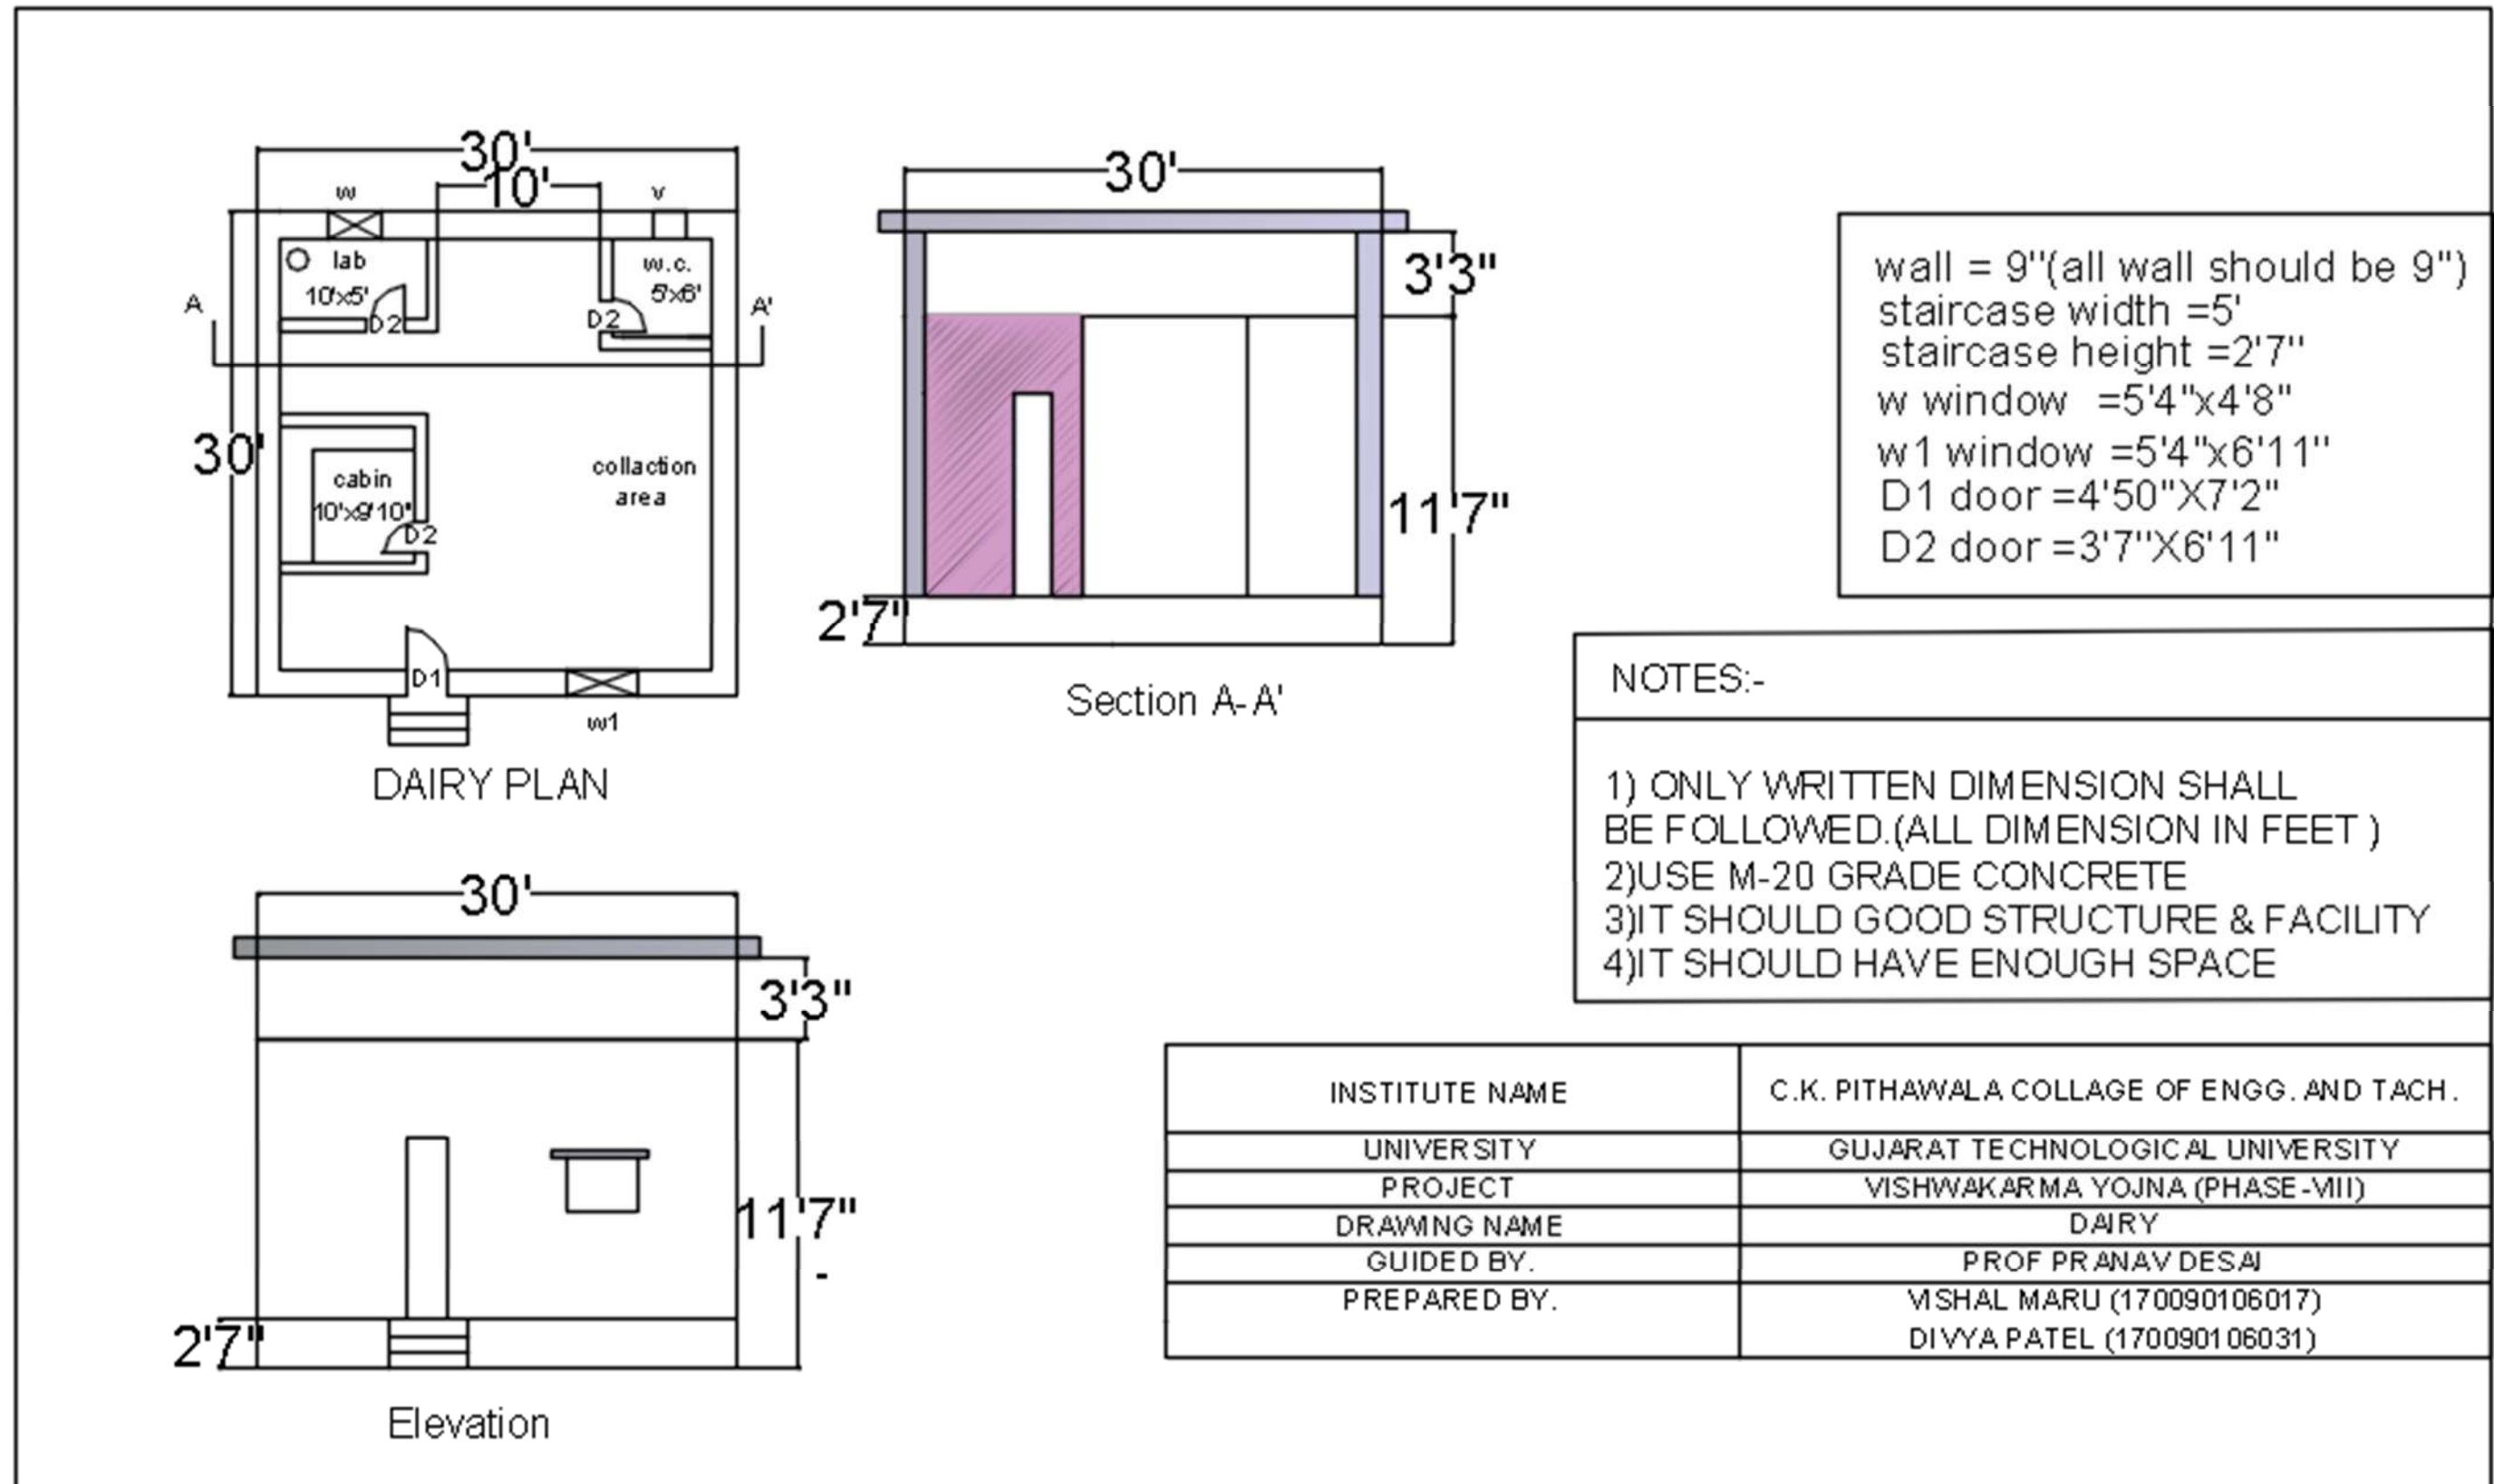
Plan, Section, Elevation of Milk Dairy
